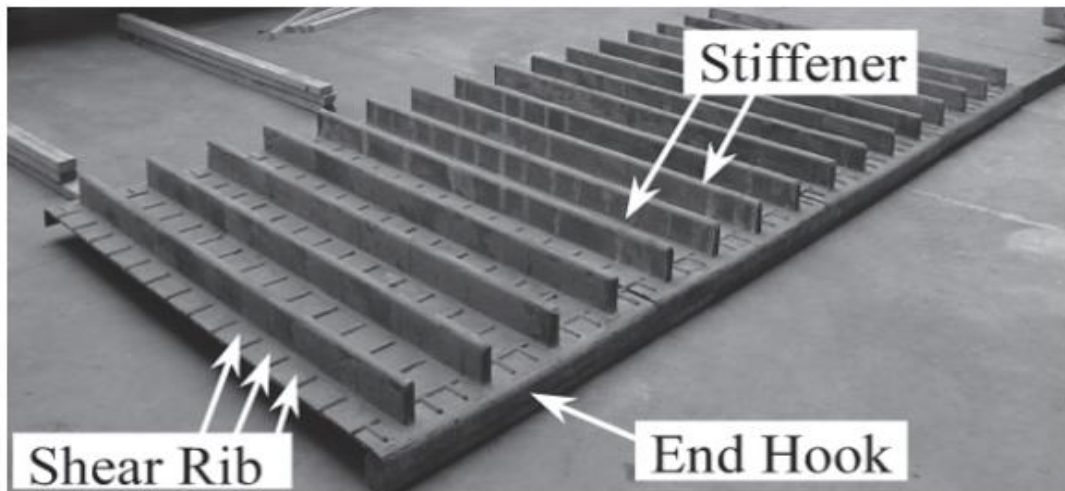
Geometry of FRP Composite Deck Panel (*Cheng et al. (2005)*)
